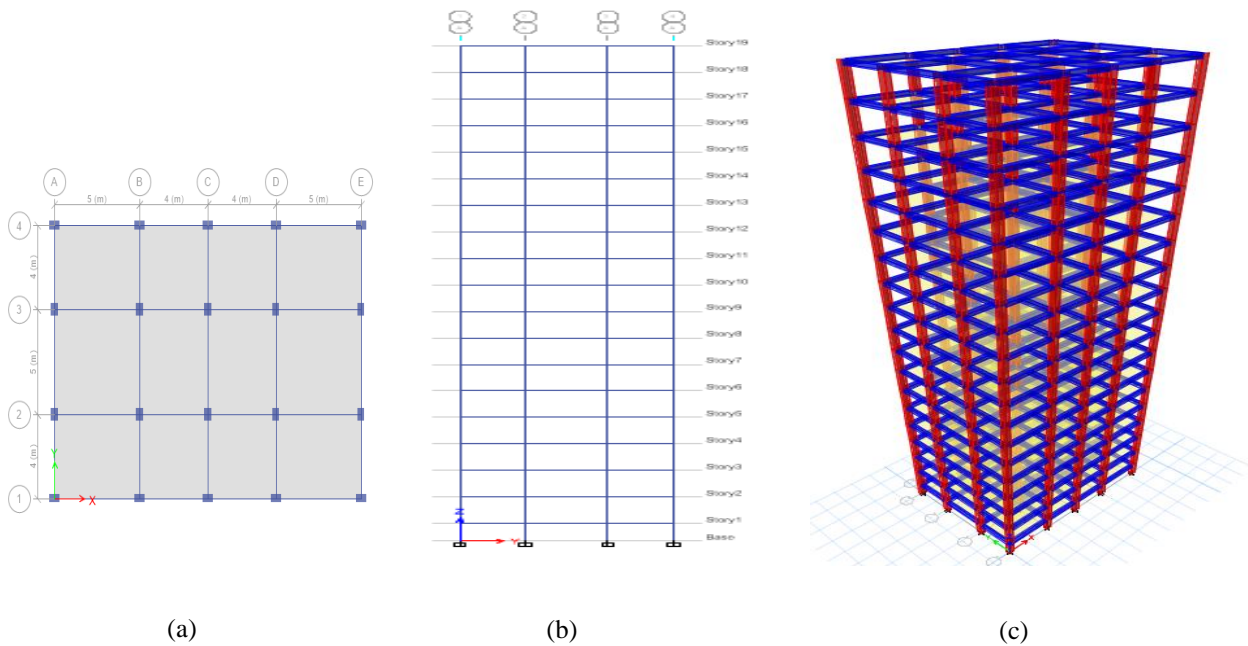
Plan of high rise building with conventional column(a) Elevation of high rise building with conventional column(b) Three-Dimensional view of high rise building with conventional column(c)
